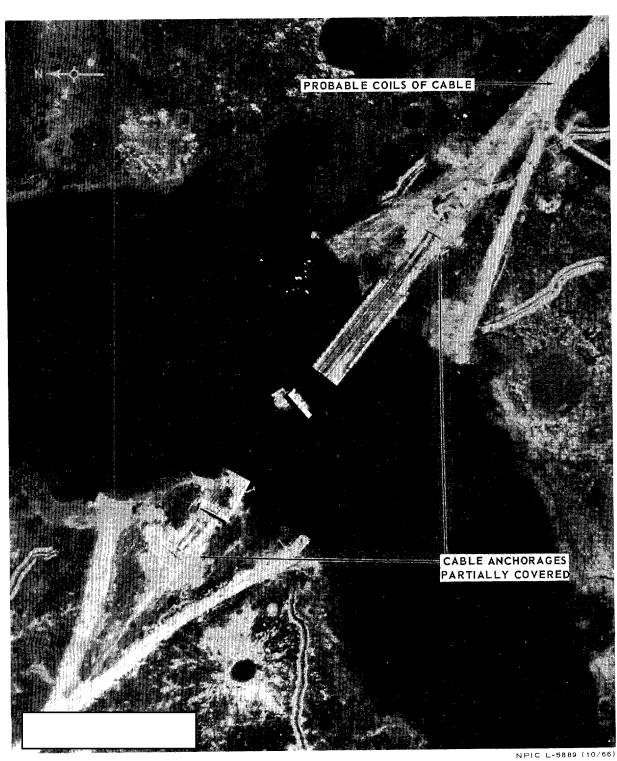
VEHICULAR CABLE BRIDGE UNDER CONSTRUCTION, ROUTE 1A, NORTH VIETNAM
